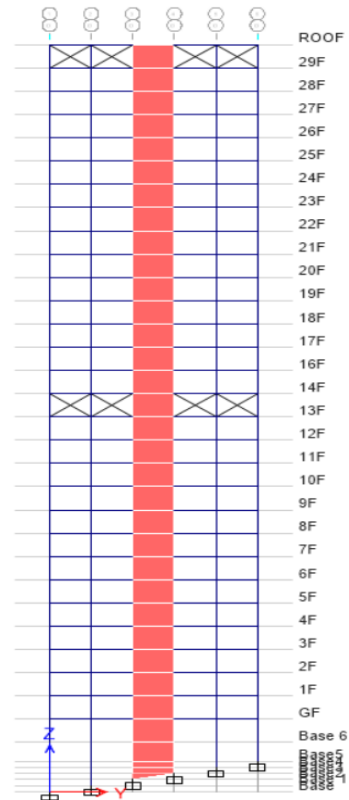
Elevation view of two outrigger bracing system for 10 degree sloping ground.
